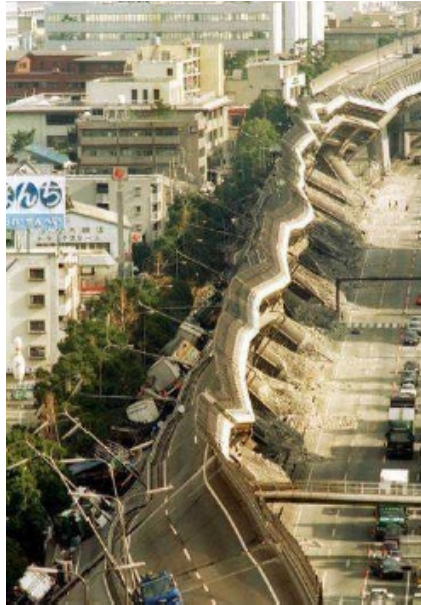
Bridge collapse in 2011 Japan Earthquake and Tsunami. (TRDB 2011).
